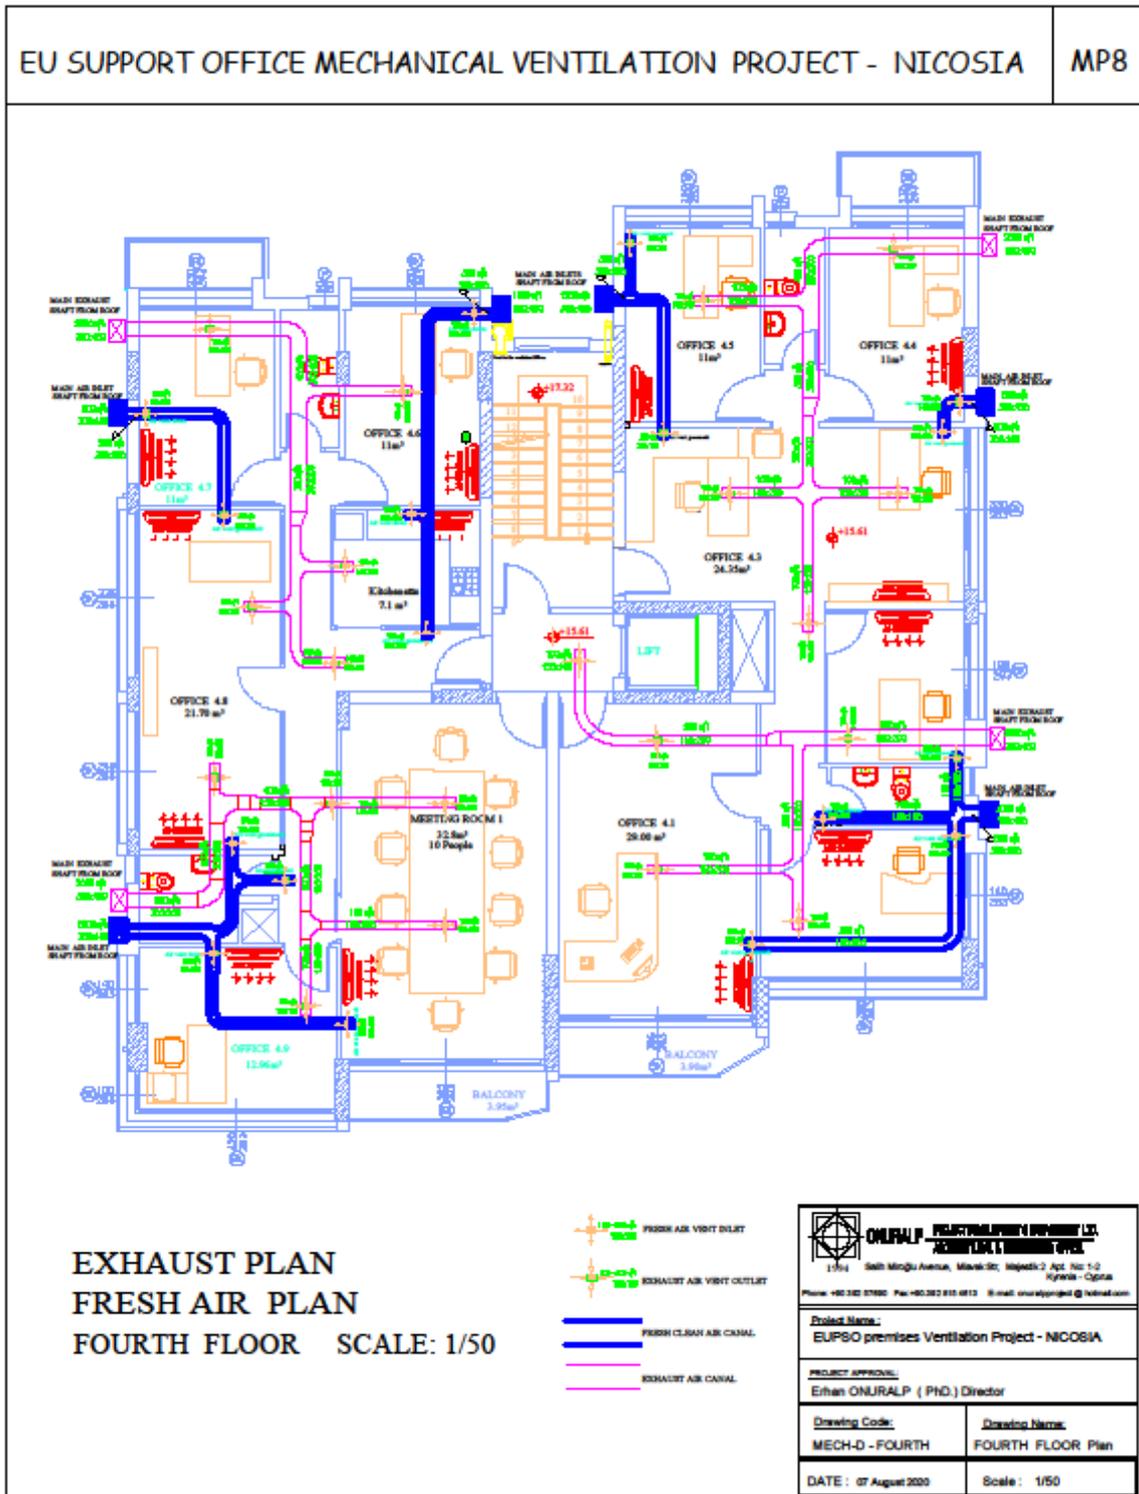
Fourth Floor plan Canal Planning Exhaust – Fresh air horizontal canals EUPSO project planning MP8
